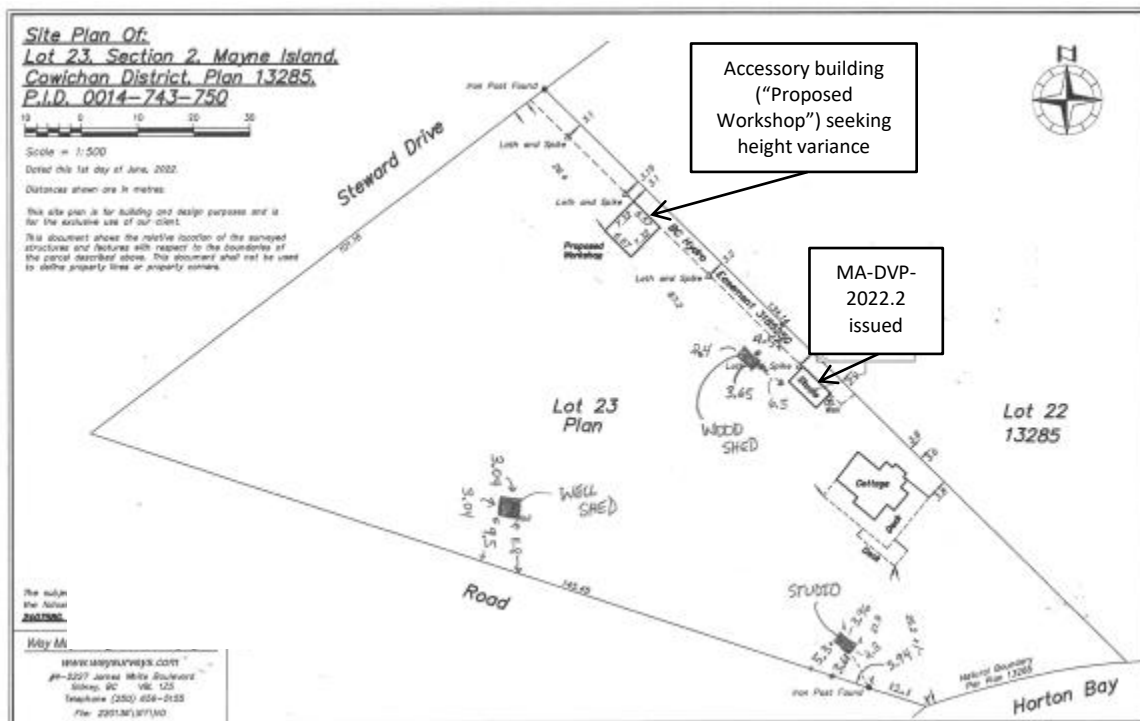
Revised site plan showing all buildings and structures on property. Accessory buildings ‘Well Shed’, ‘Wood Shed’, and the ‘Studio’ nearest the natural boundary of the sea have not been verified by survey.
